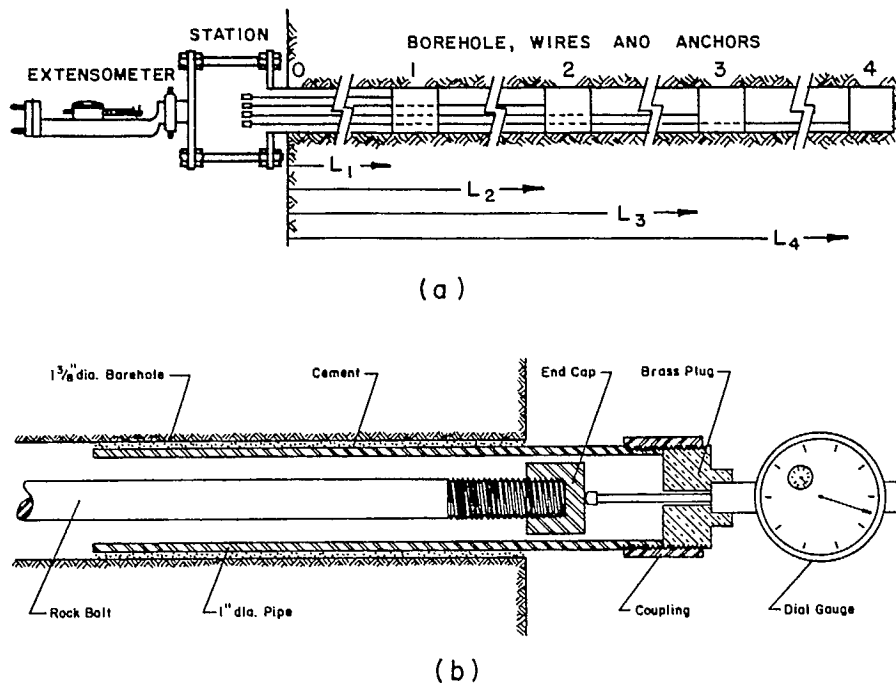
Diagram illustrating installed borehole extensometers - (a) multiwire type, and (b) rock bolt type.
